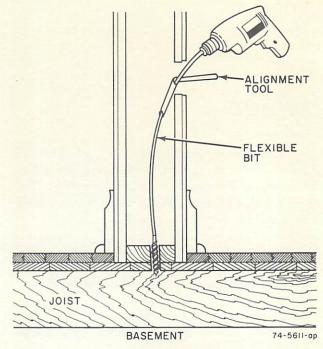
Gaining Access to Wall Using Flexible Bit.
